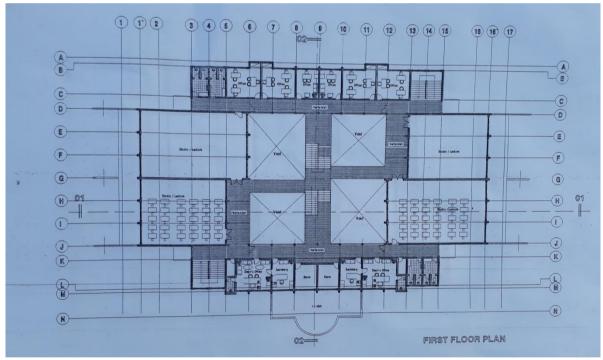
Plate IV: Floor plan of the faculty of environmental Technology A.T.B.U. Bauchi Source: P.P.U. A.T.B.U Bauchi(2022)
